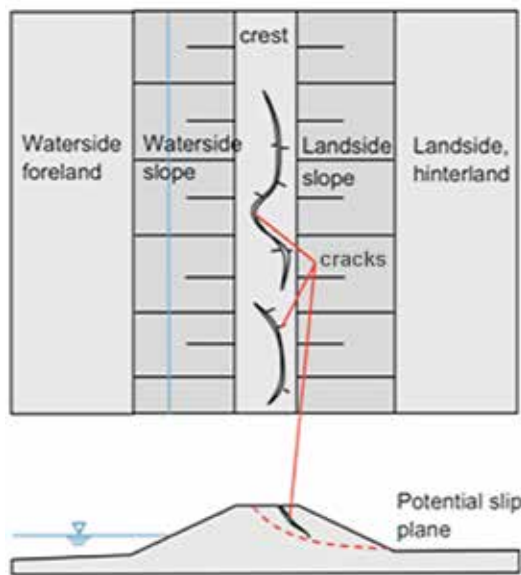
Plan and cross section view of desiccation cracks on the crest
